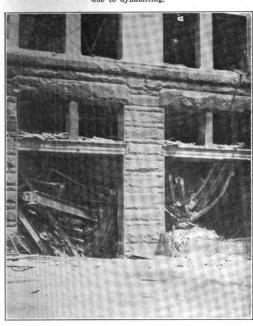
Bottom of old Chronicle Building, showing fallen floor beams.
